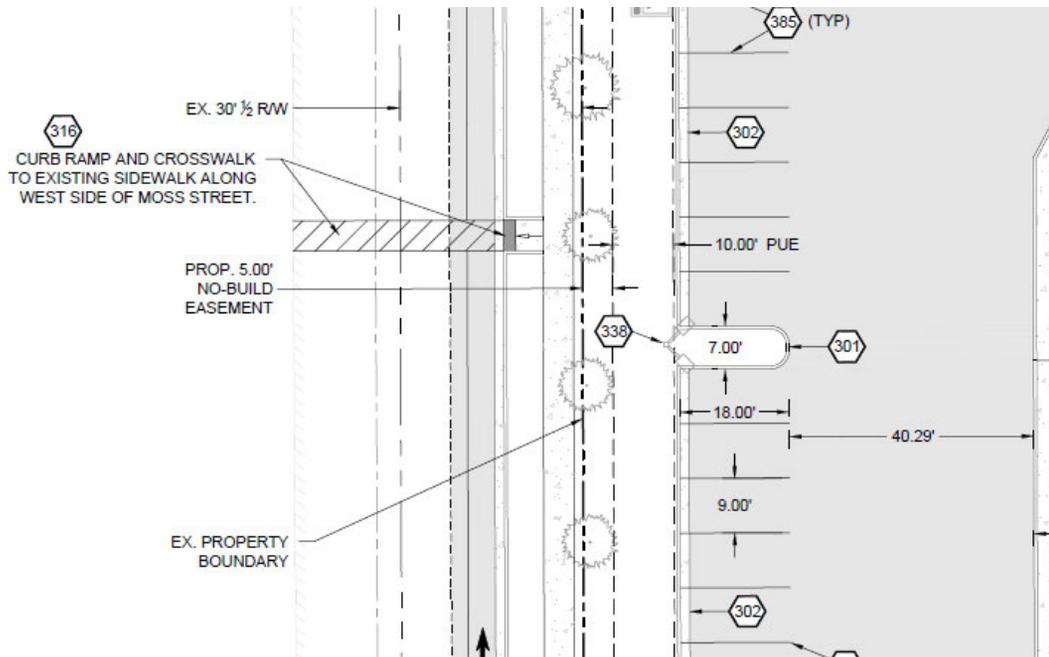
Applicant's proposal to construct a pedestrian crosswalk across North Moss Street.
